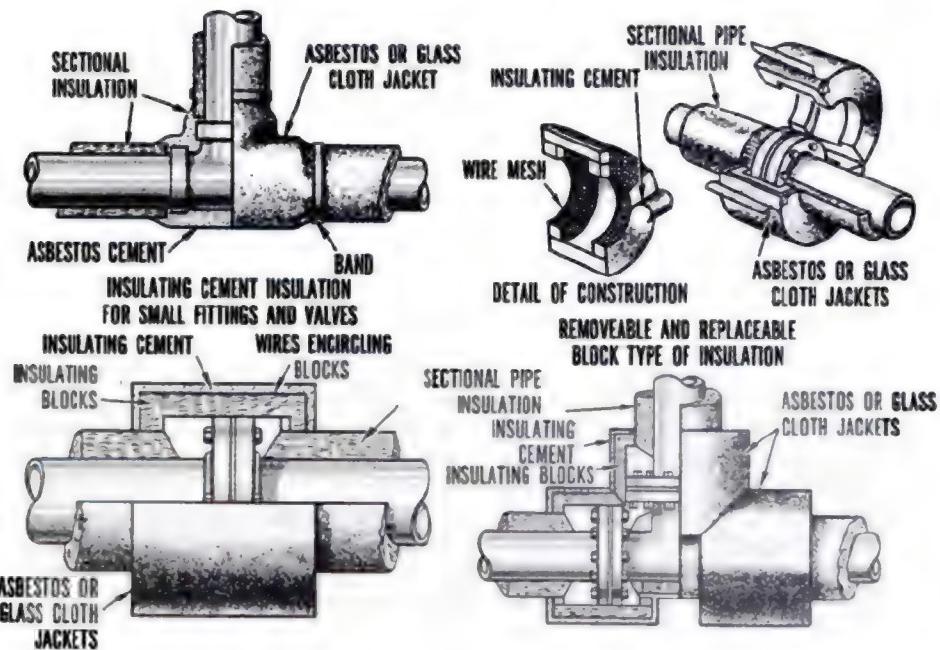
Permanent type insulation of pipe fittings, flanges, and valves.
